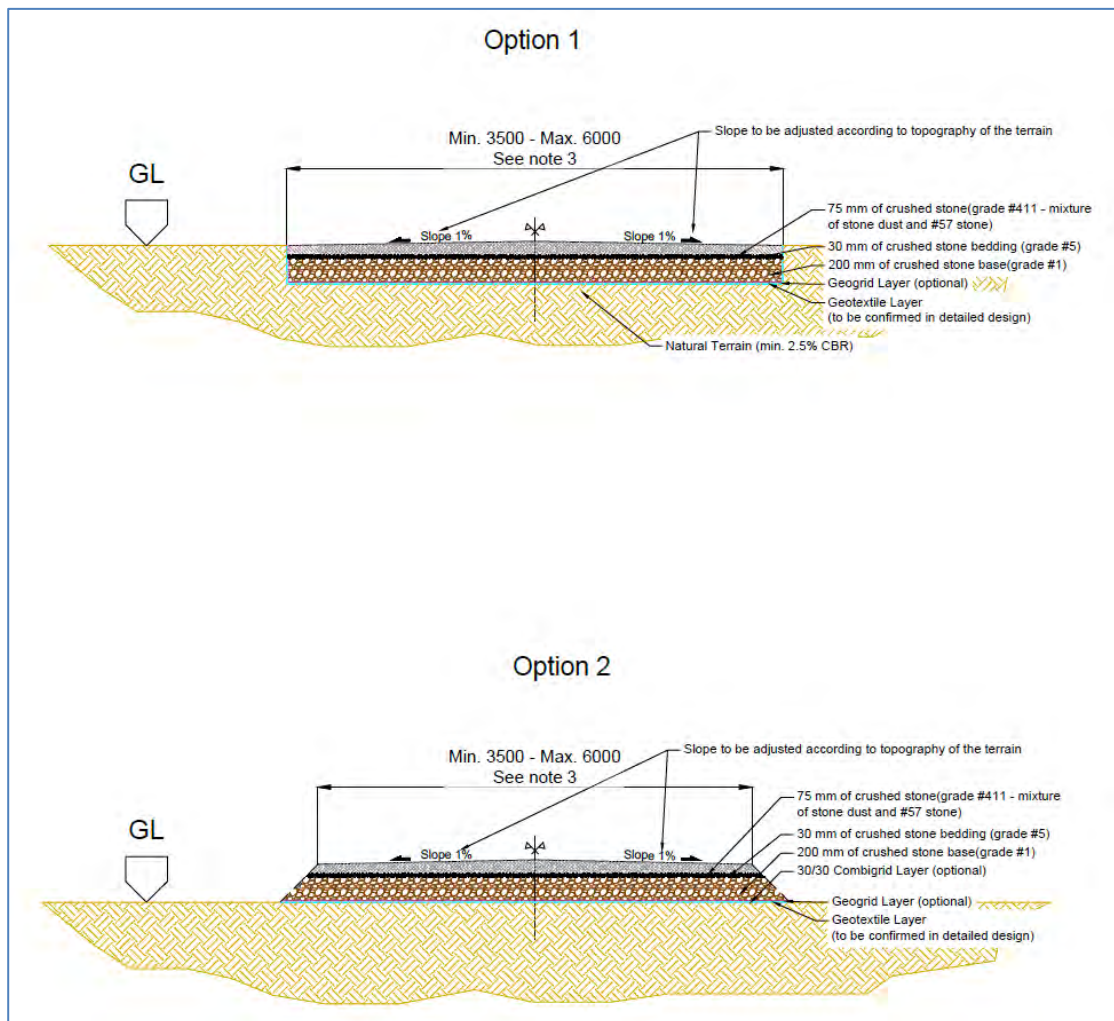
Internal track section detail (SCUKX-ALLES-000-MCS-201 (20240531))
